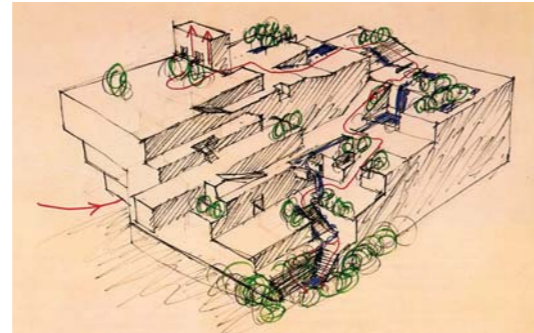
HOLLEIN, Hans – *Scalable Department Store*, St. Louis, 1963.
